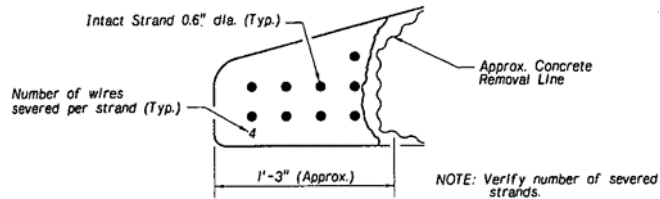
Severed strand in Girder A, from the repair documents of Wood River Interchange Bridge, courtesy of NDOT
